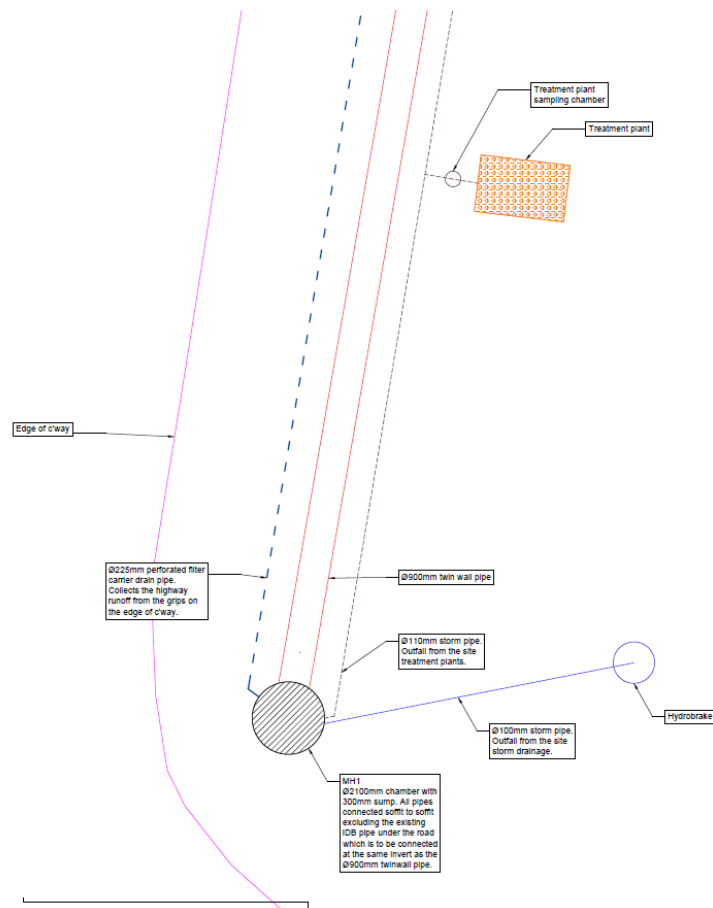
Extract from plan submitted by the applicant (Poptil-DG-IDB Drain-Design Proposal Rev.B, 10/06/2020)
